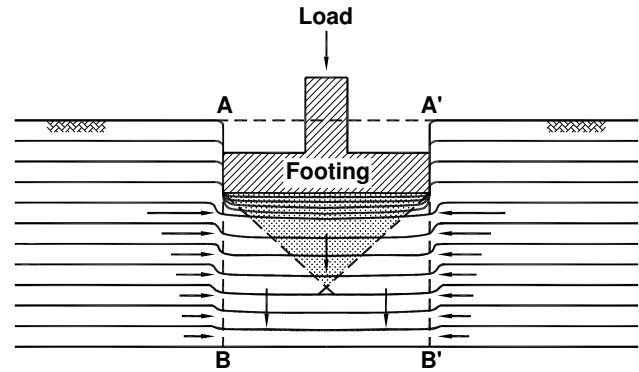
Failure mechanism in unsaturated fine-grained soils below a footing.
